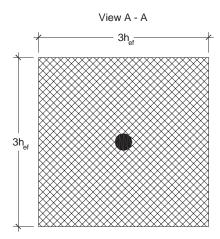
Full Breakout Cone in Tension per ACI 318-02
